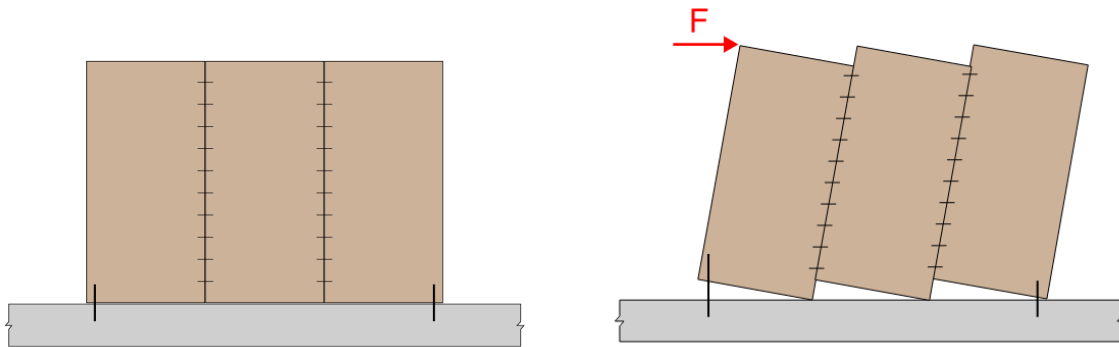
CLT shearwall system and deformation (courtesy of Aspect Structural Engineers).
